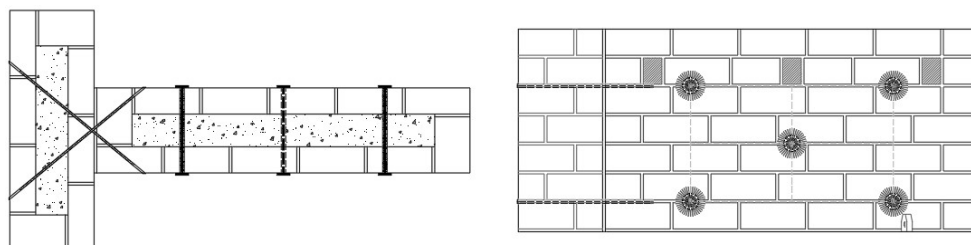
T-wall reinforcement: plan view (left) and front elevation (right)
